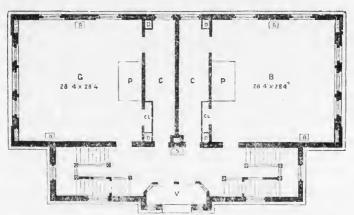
, -Pran of a Ground Floor, with Moderications adapted to Design No. 50.
